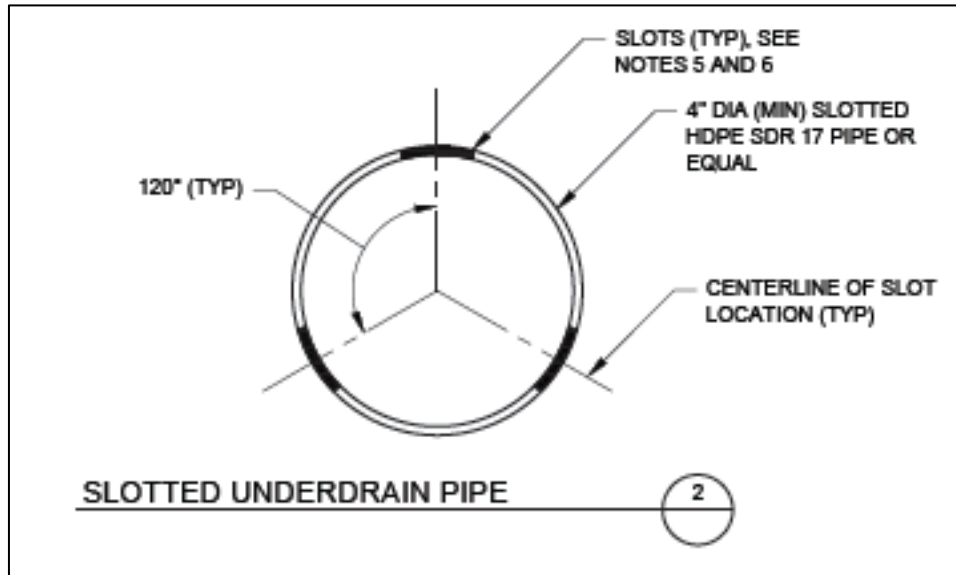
Slotted Underdrain Pipe Detail (Credit: SFPUC and GI Design Guide)
